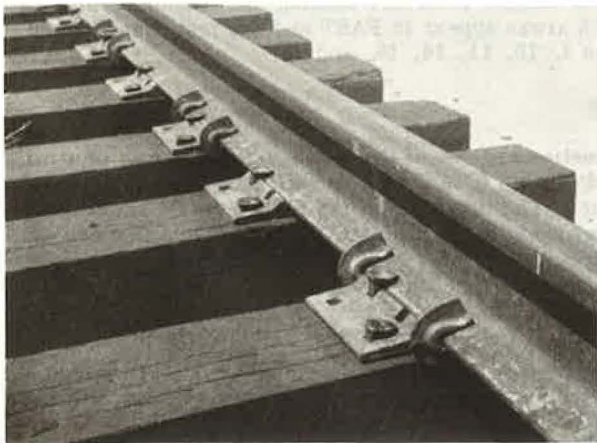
Typical arrangement of tie plates, spikes, and rail anchors (new track—ballast not in place).
